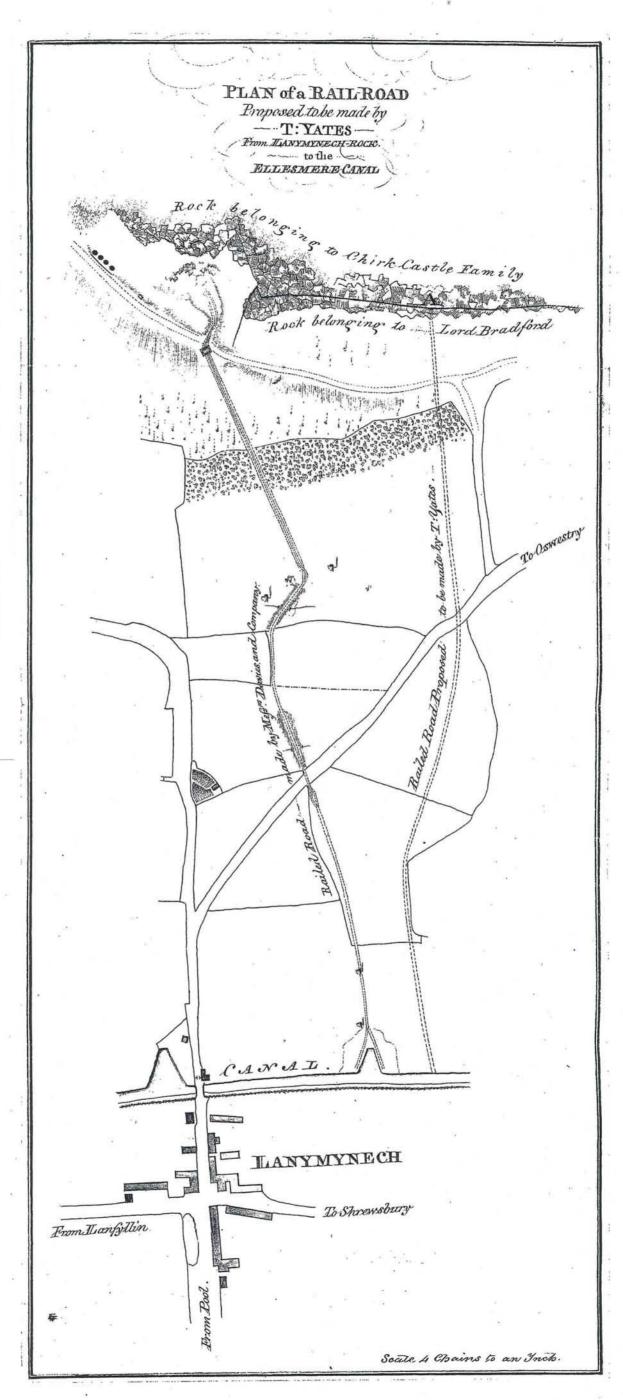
1807 plan of a railroad proposed from Llanymynech Rock to the Ellesmere Canal (NLW Chirk Castle v6046)
